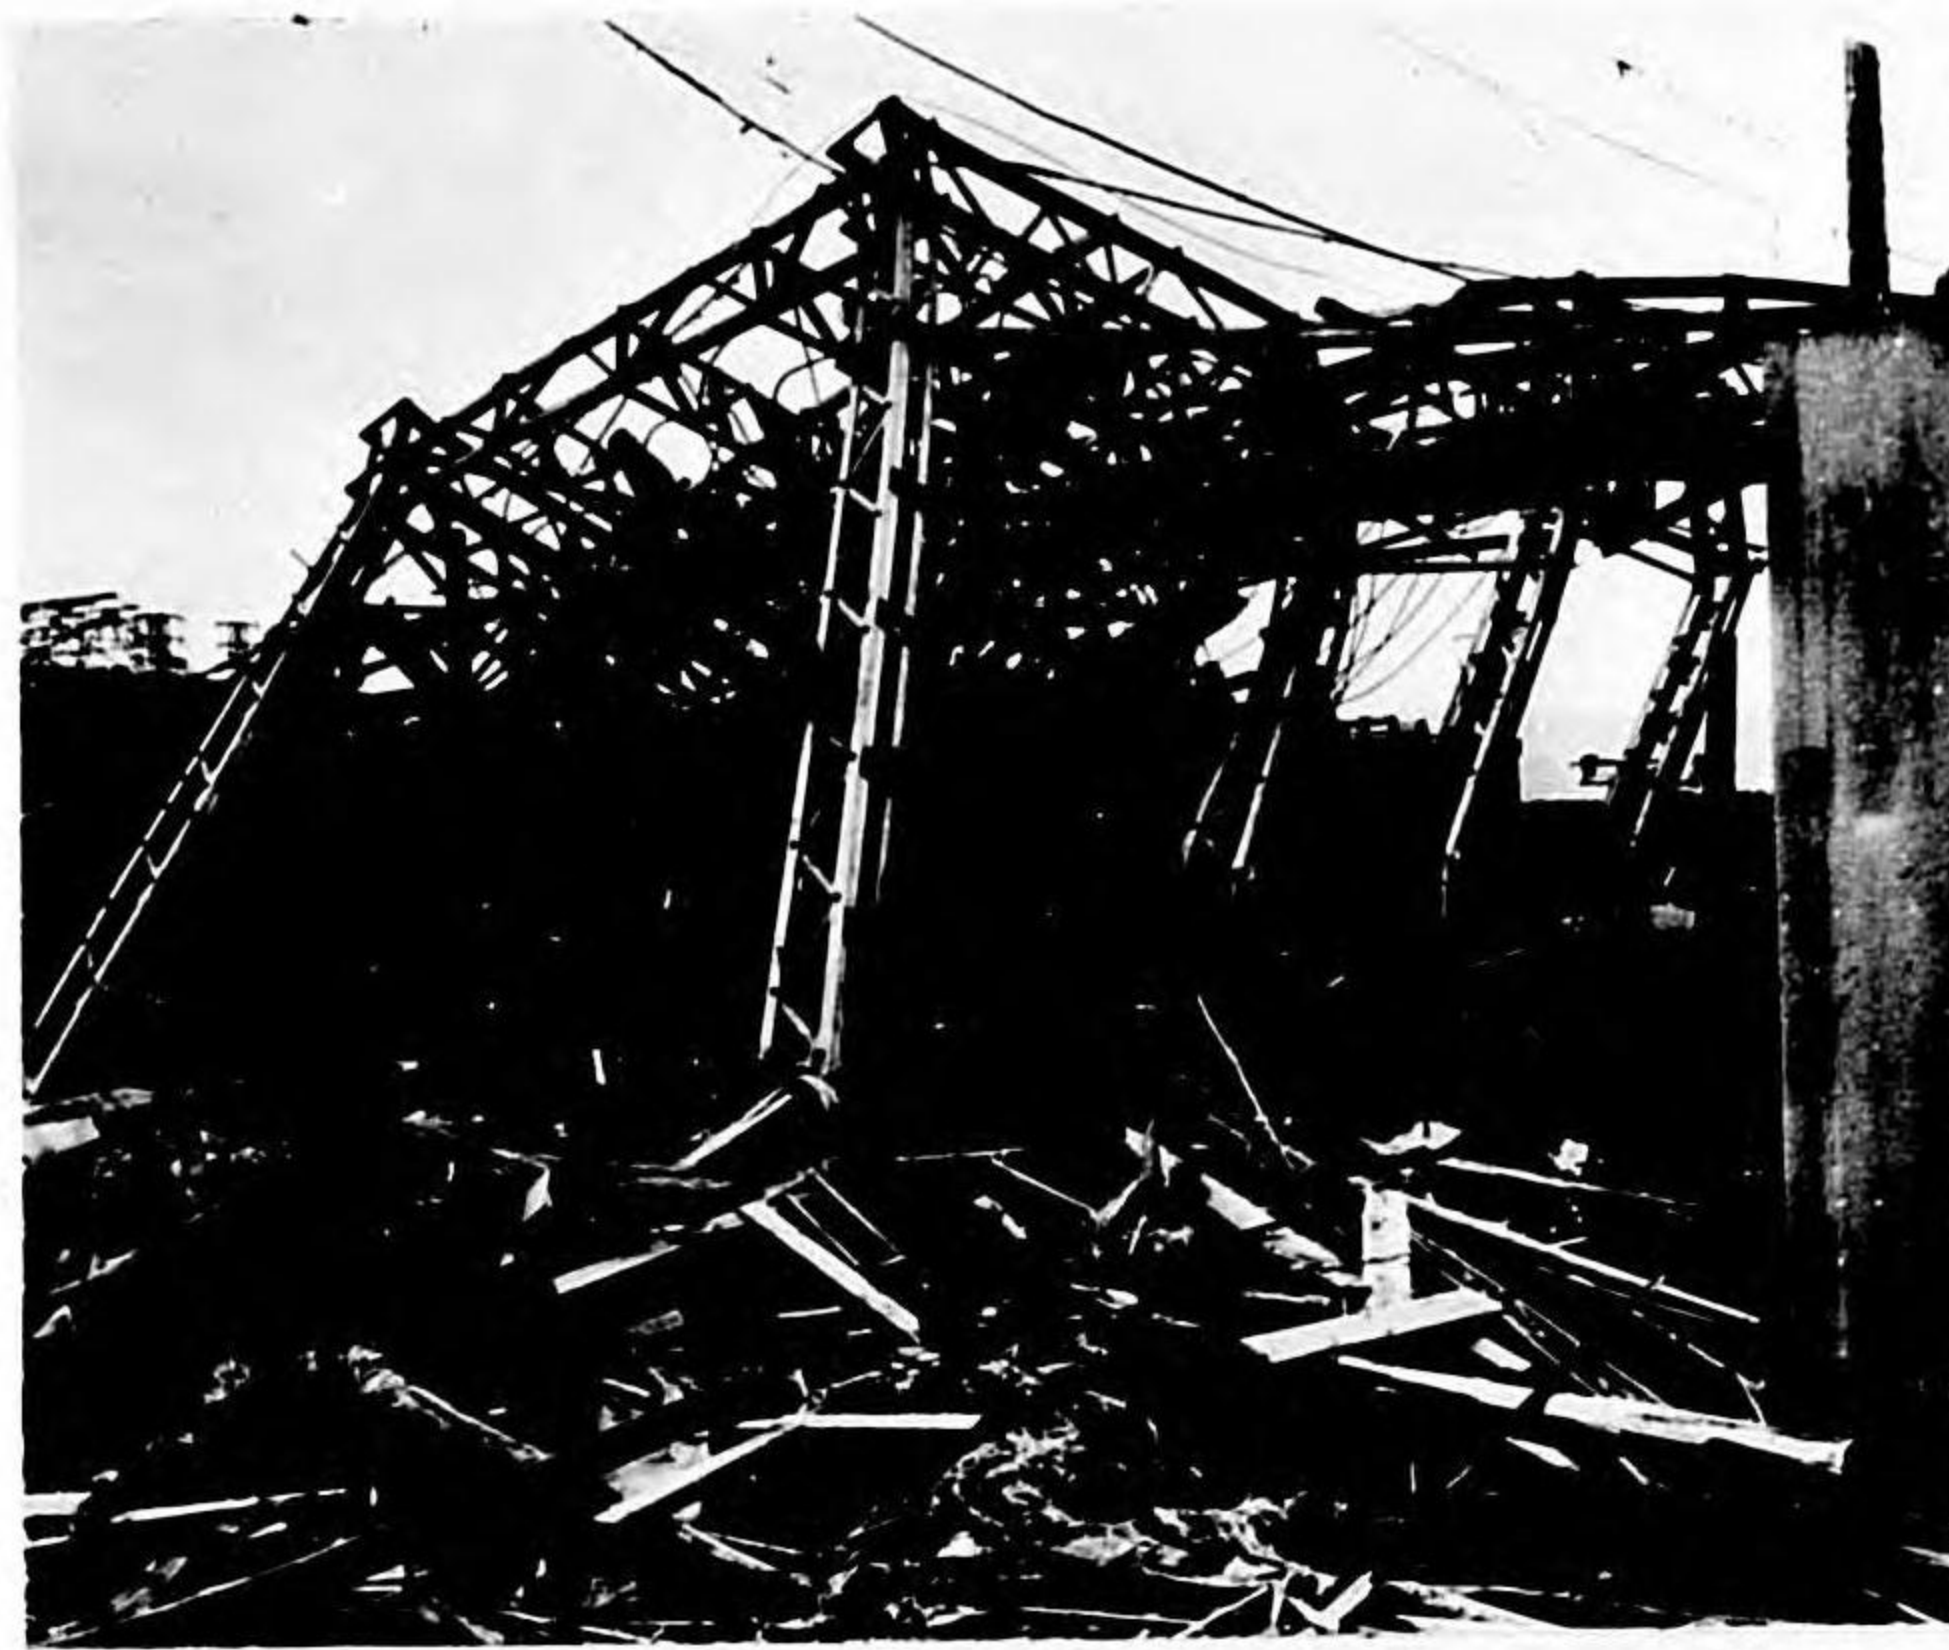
Same as Photo 180. South tower twisted and trusses bent.
